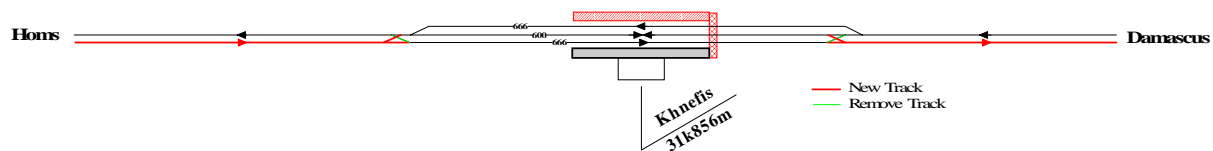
Sketch of Khnefis station improvement track layout
